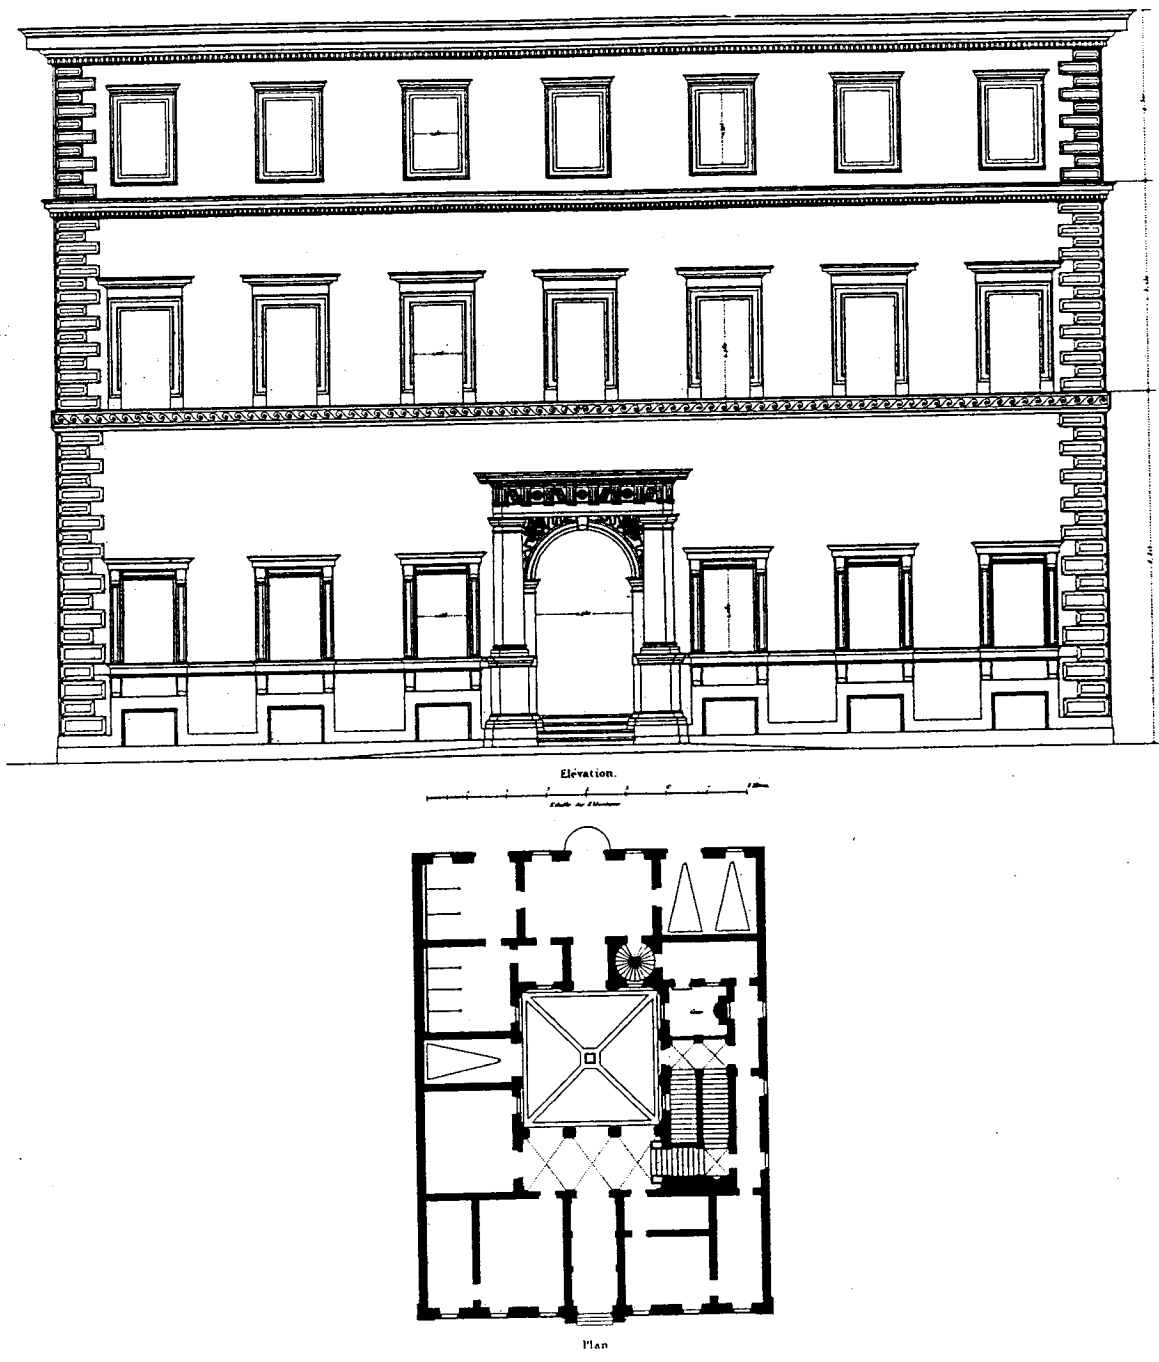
Palazzo Baldassini: facade and plan (from Letarouilly)
